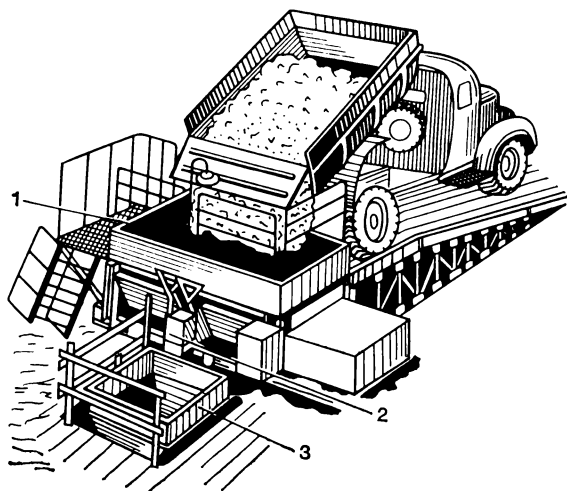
Installation for unloading, mixing and discharging of mortar at a construction site
